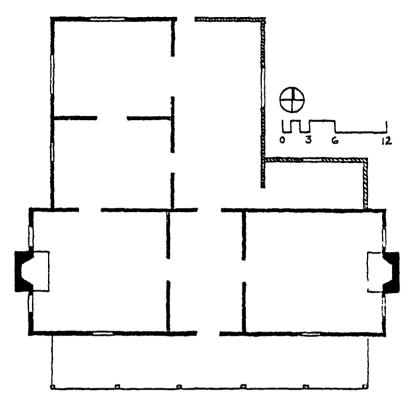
Plan of the J. T. Butler house, a frame dogtrot type built in 1913. Bay Springs Tract 801b, Tishomingo vicinity, Tishomingo County, Mississippi. HABS plan.
